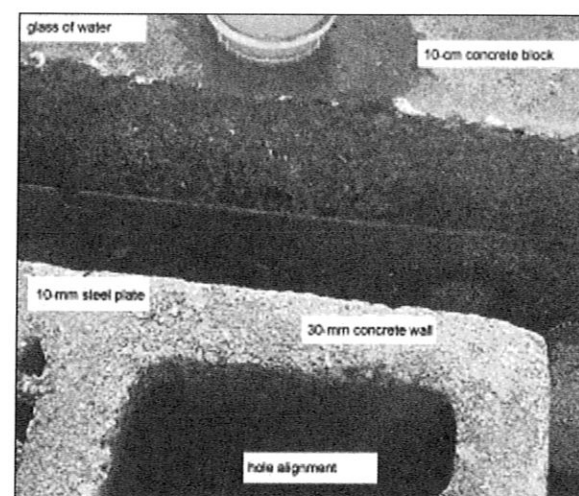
Hole drilled through concrete and steel, note the glass of water.
